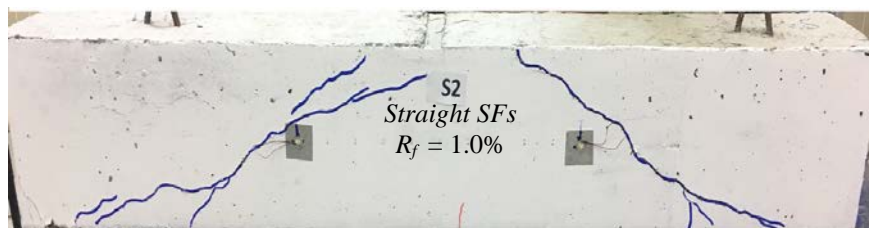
Diagonal crack in an SF-reinforced concrete beam
